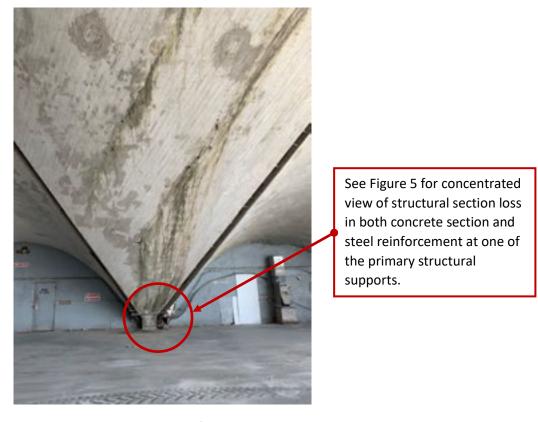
Severe concrete spalling and corroded steel reinforcing at existing primary structural support.
